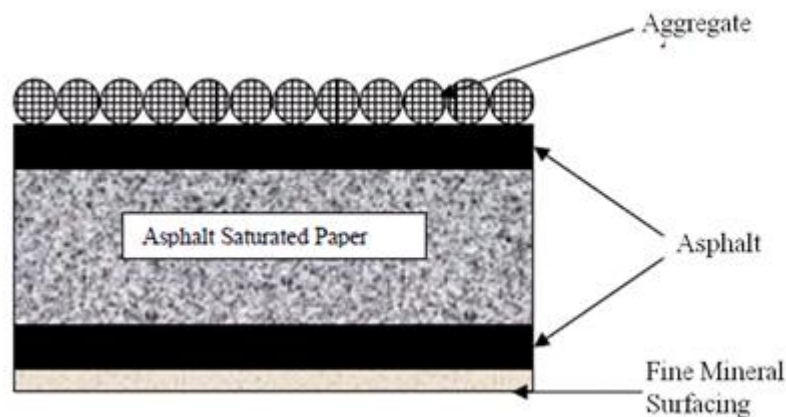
Profile View of a Typical Asphalt Shingles [Austin 2011]
